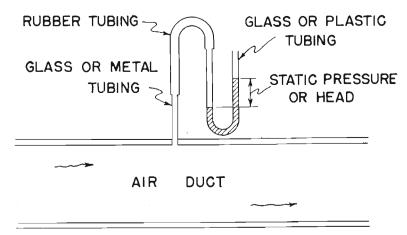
Manometer or U-tube arrangement for checking static pressure.
